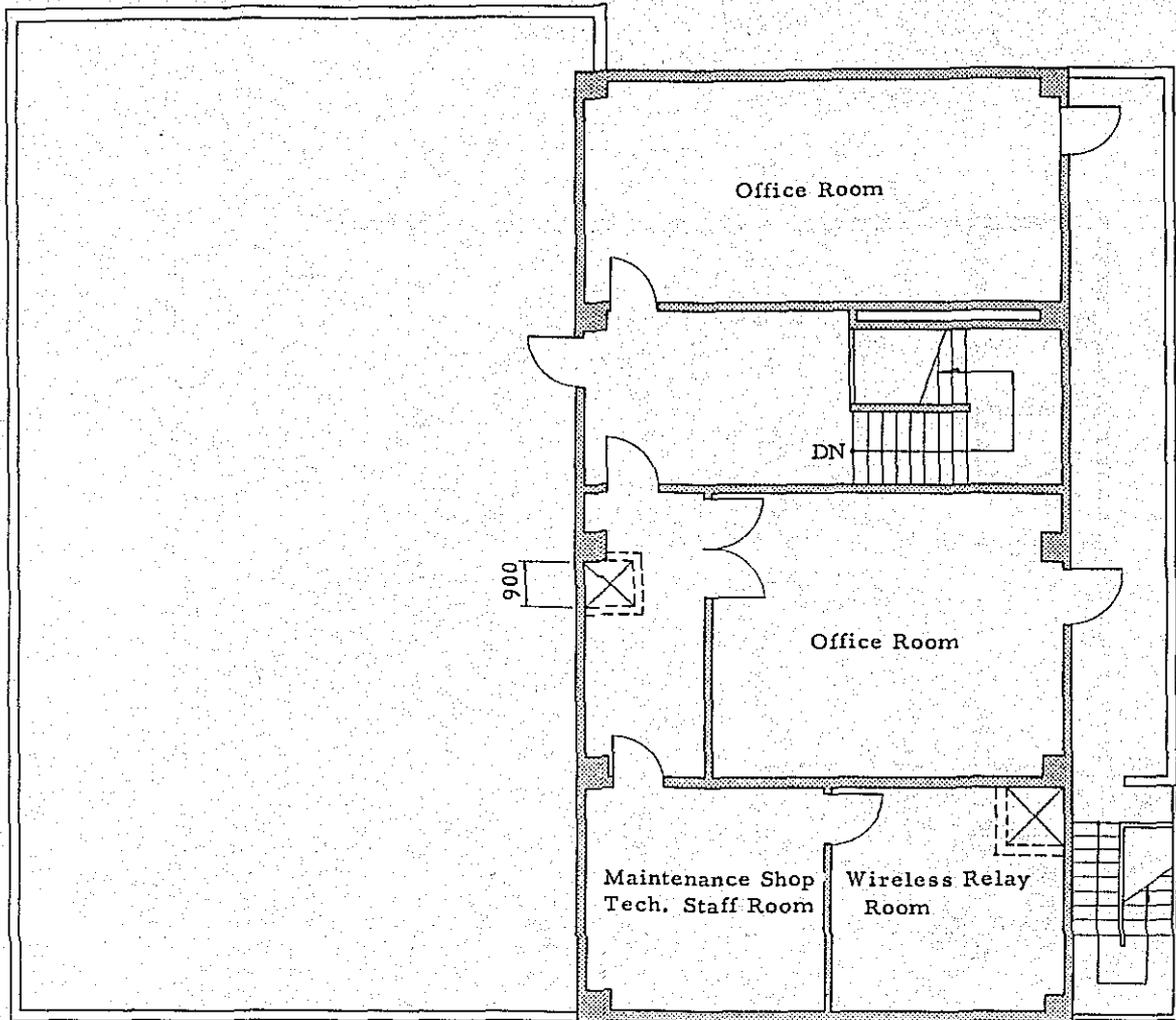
Lay out PLAN of New Radio Studio Building - 4F & Roof PLAN
